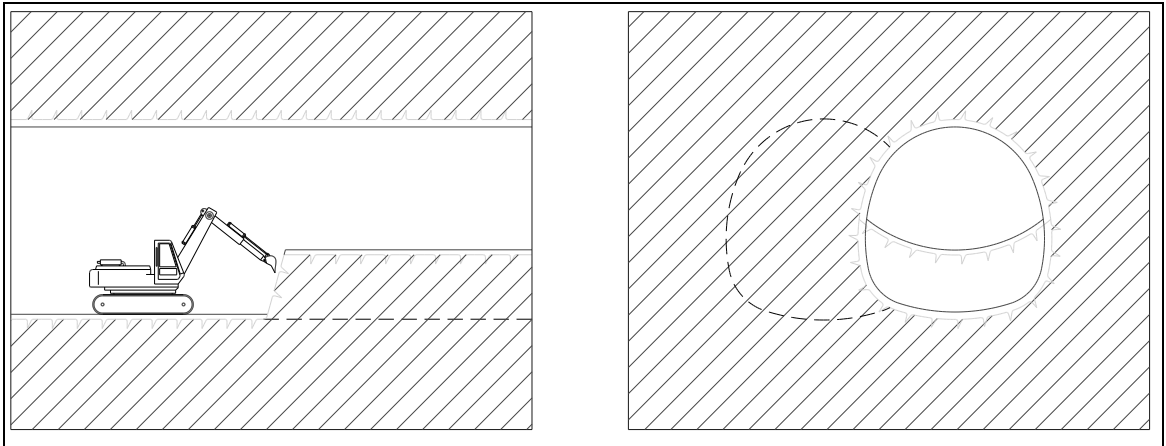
Stage 7 – Excavation OB Tunnel B/I
